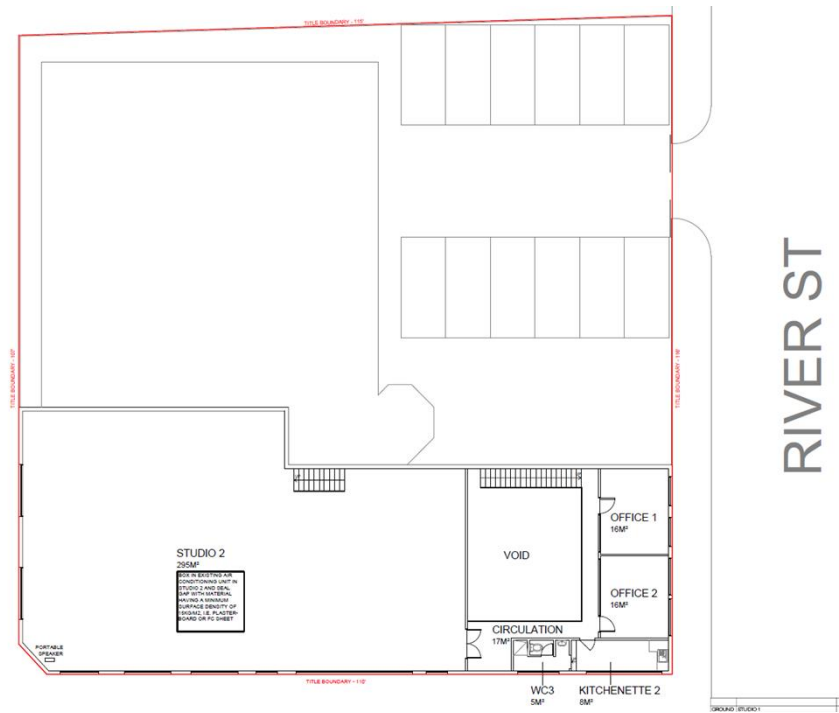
Proposed level 1 layout (Source: Decision Plans)
